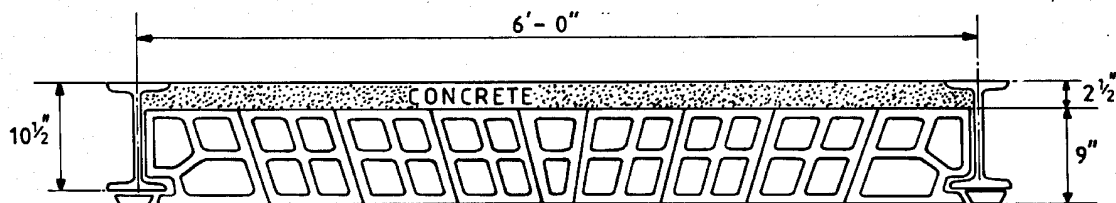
Beams designed into the floor of the Home Insurance building, Chicago 1885
